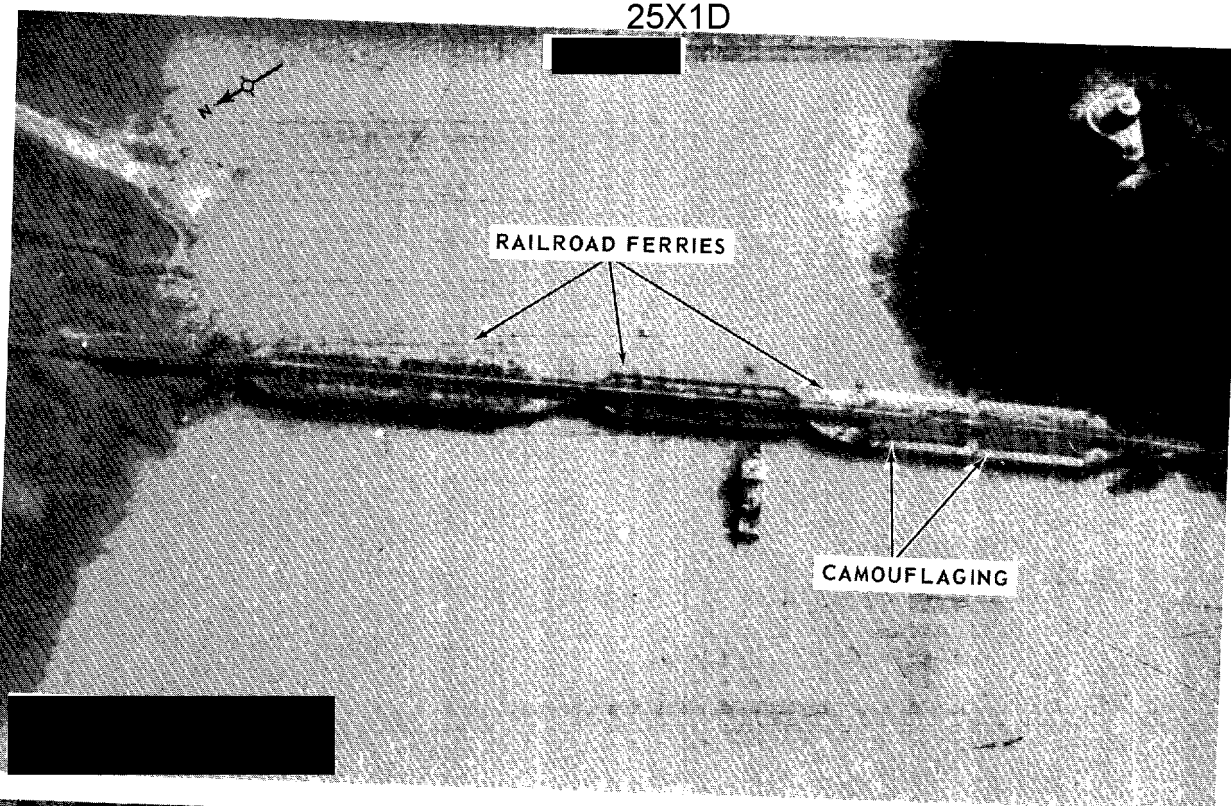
RAILROAD FERRY CROSSING AND TEMPORARY BRIDGE, NINH BINH, NORTH VIETNAM
